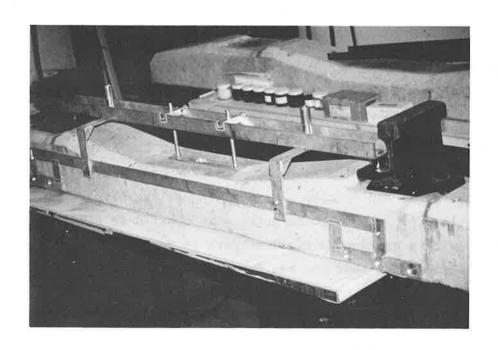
STRAIN GAGE LOCATING FIXTURE POSITIONED ON CONCRETE CROSSTIE
